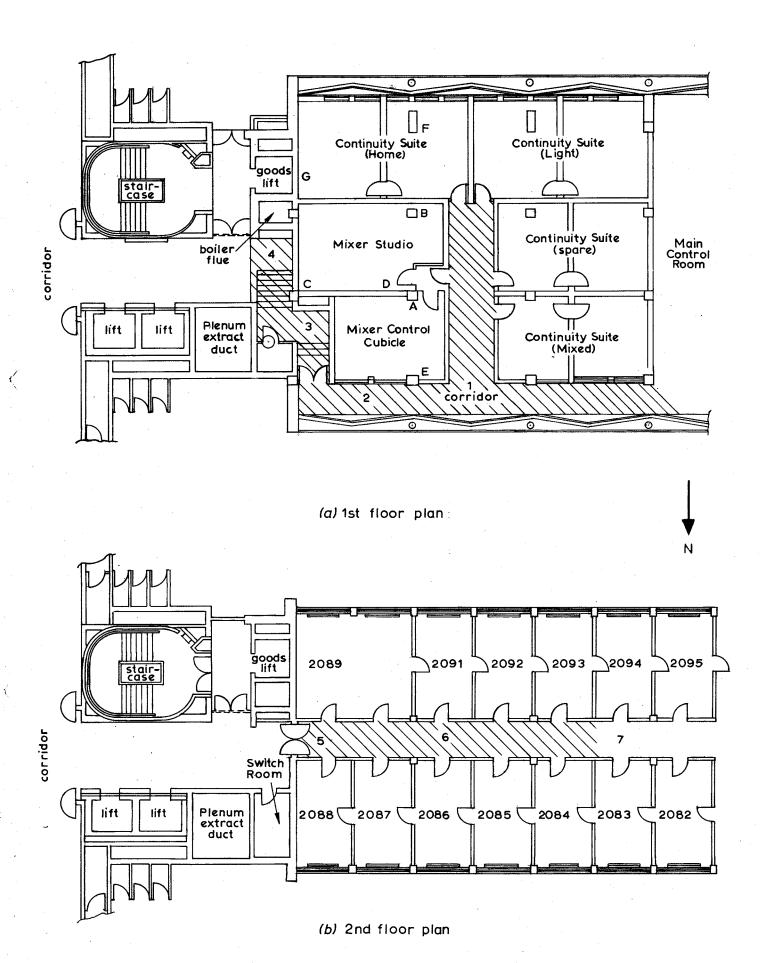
Broadcasting House extension, Plan view of part of 1st and 2nd floors.
